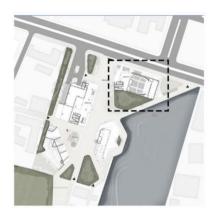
Blowup 1 of Ground Floor Plan. Source: Author
